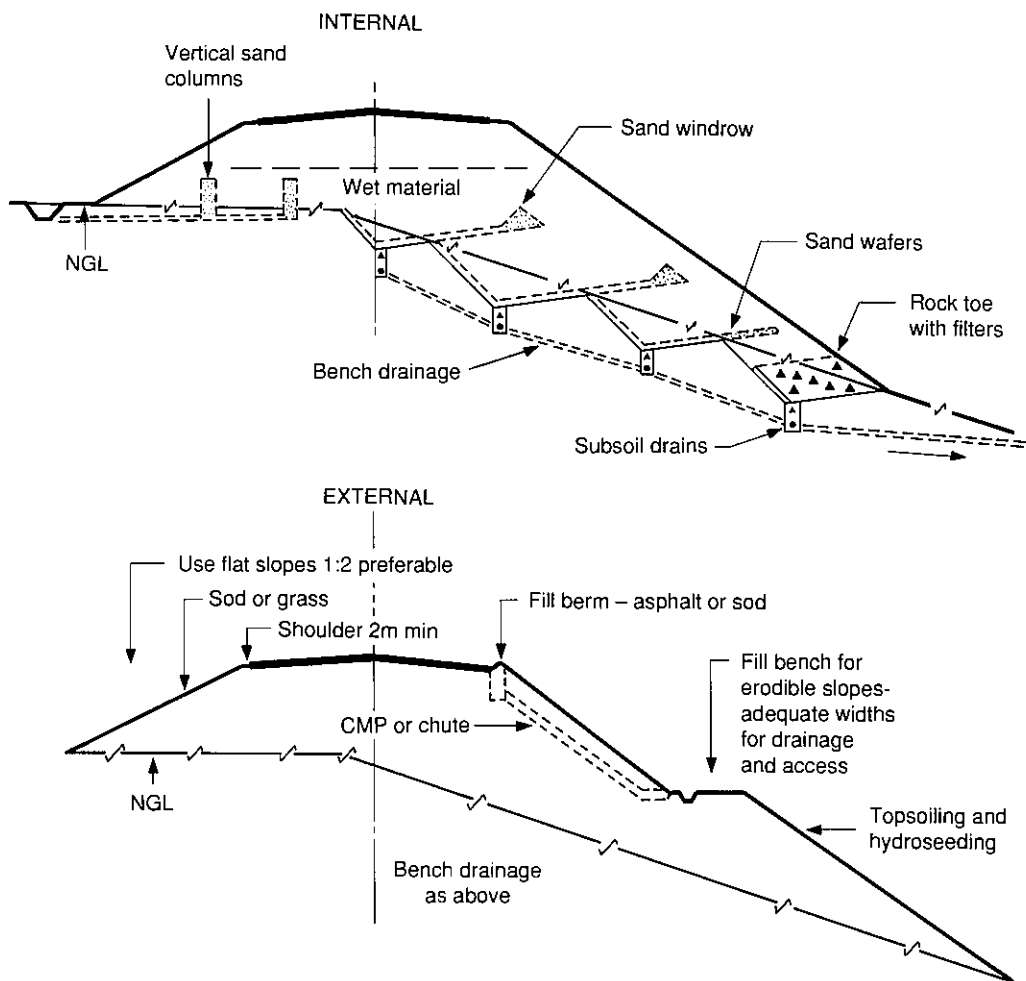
Drainage of embankments constructed with weak soils (CSIR, Technical Recommendations for Highways, TRH9).
